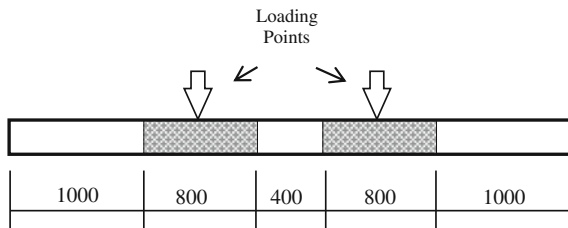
Setting of CFRP sheets (elevation-view, dimension in mm)
